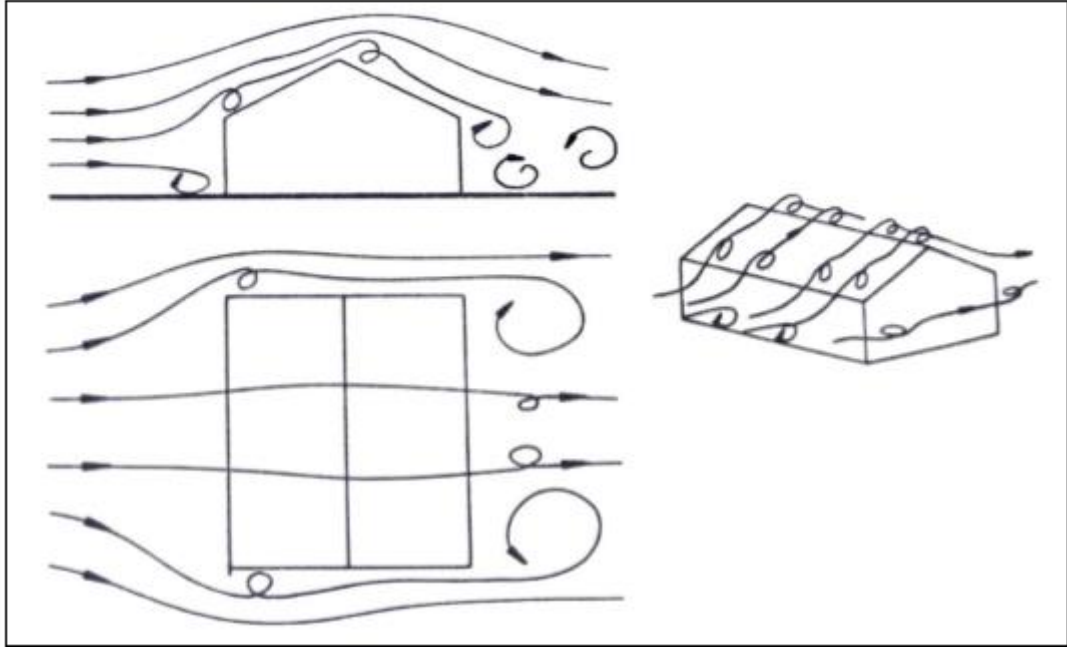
Wind Flow over a Low Rise Pitched Roof Type Structure
